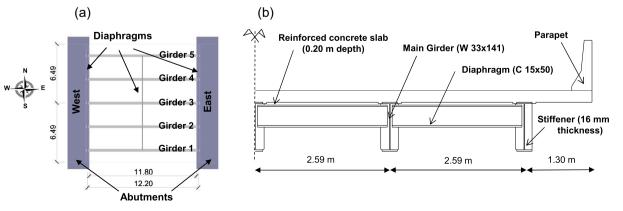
Bridge definition. (a) Plan view (without the concrete slab). (b) Half section.
